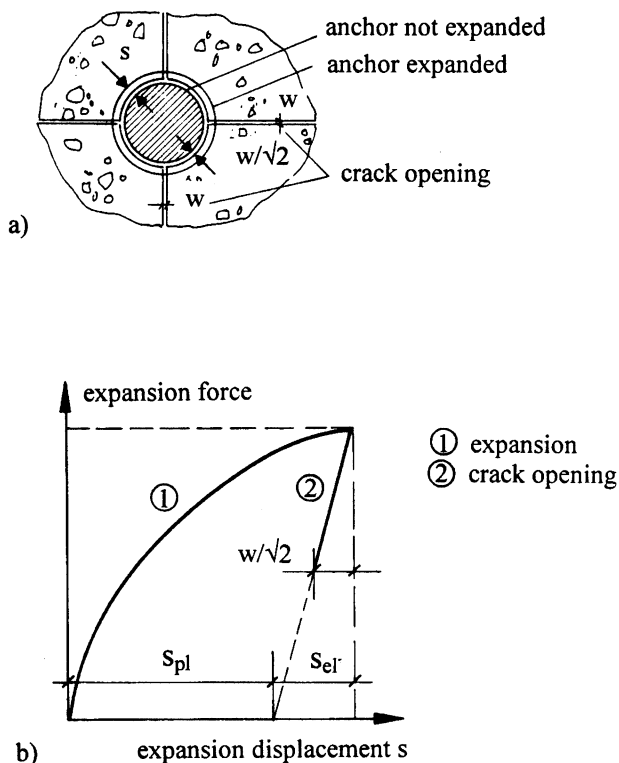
Influence of opening of intersecting cracks on expansion force of drop-in anchors
